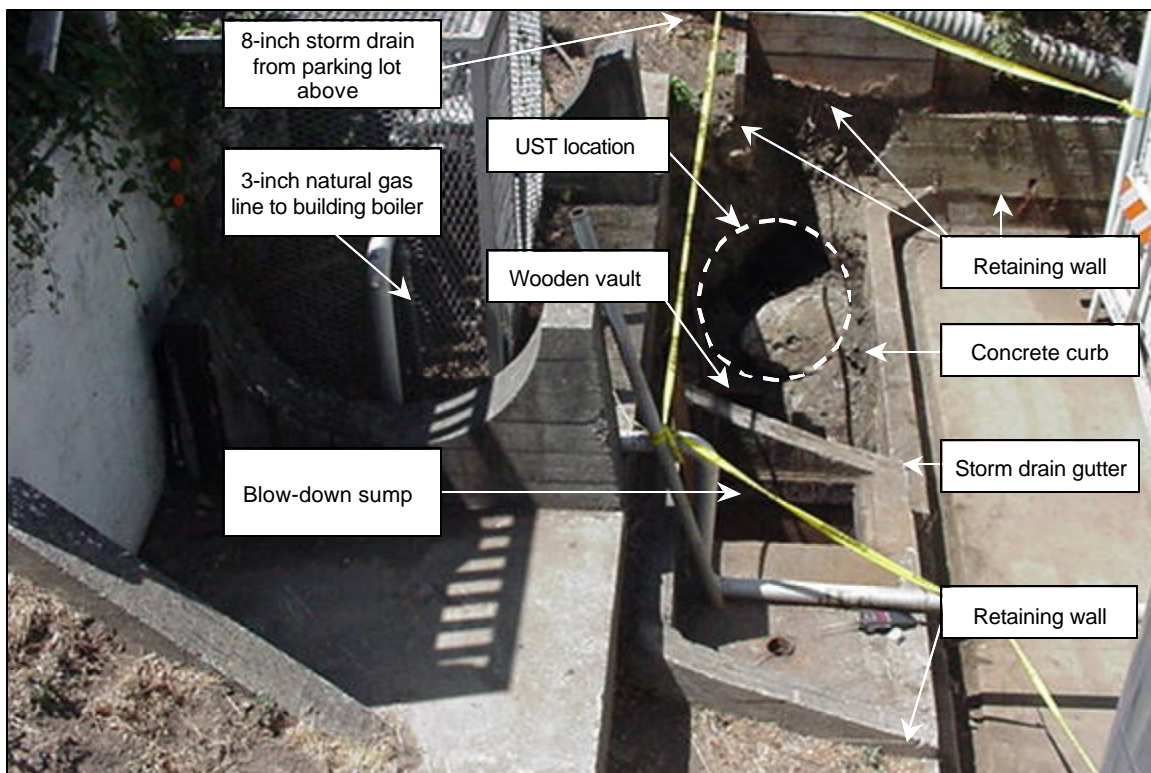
View of TPH removal area between the wooden stairway and catch basin at the northwest corner of Building 66.
